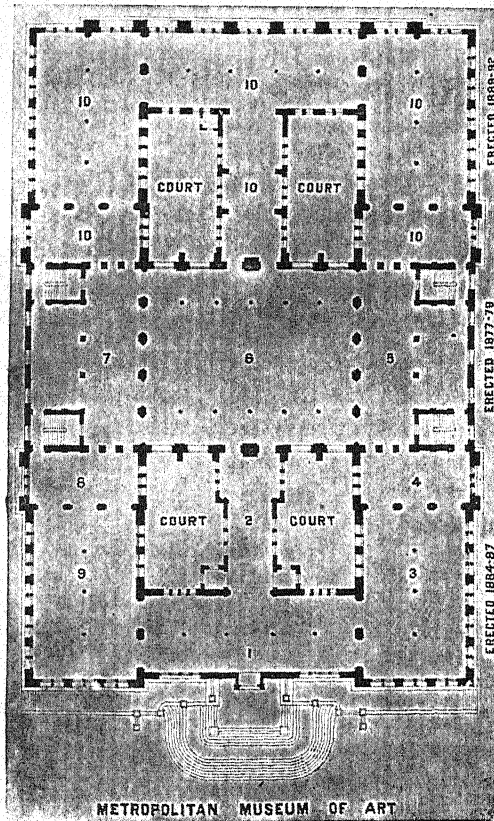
Metropolitan Museum of Art. Plan of first floor.
